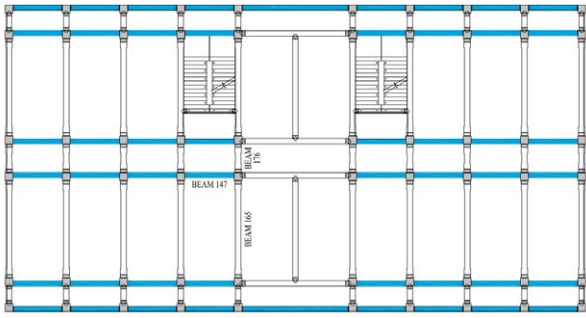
FRAME BEAMS DESIGNATED AS SECONDARY BEAMS
